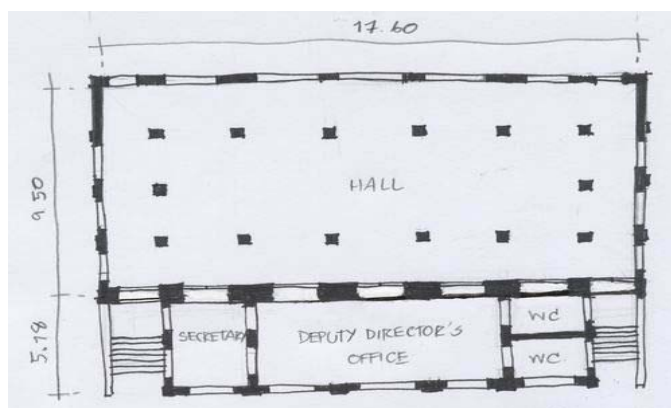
Thong Phra Rong Wang Klang : Sketch of plan.
